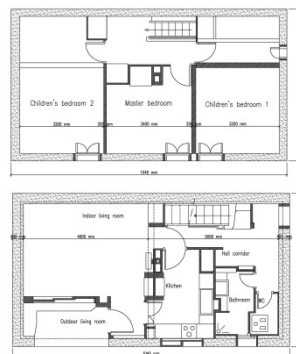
Standard plans of the stabilized rammed earth houses in the Village of Mostefa Ben Brahim.
